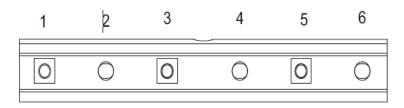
Figure SUB-PART D – 54 – Example of 6-Hole Joint Bar Bolted
